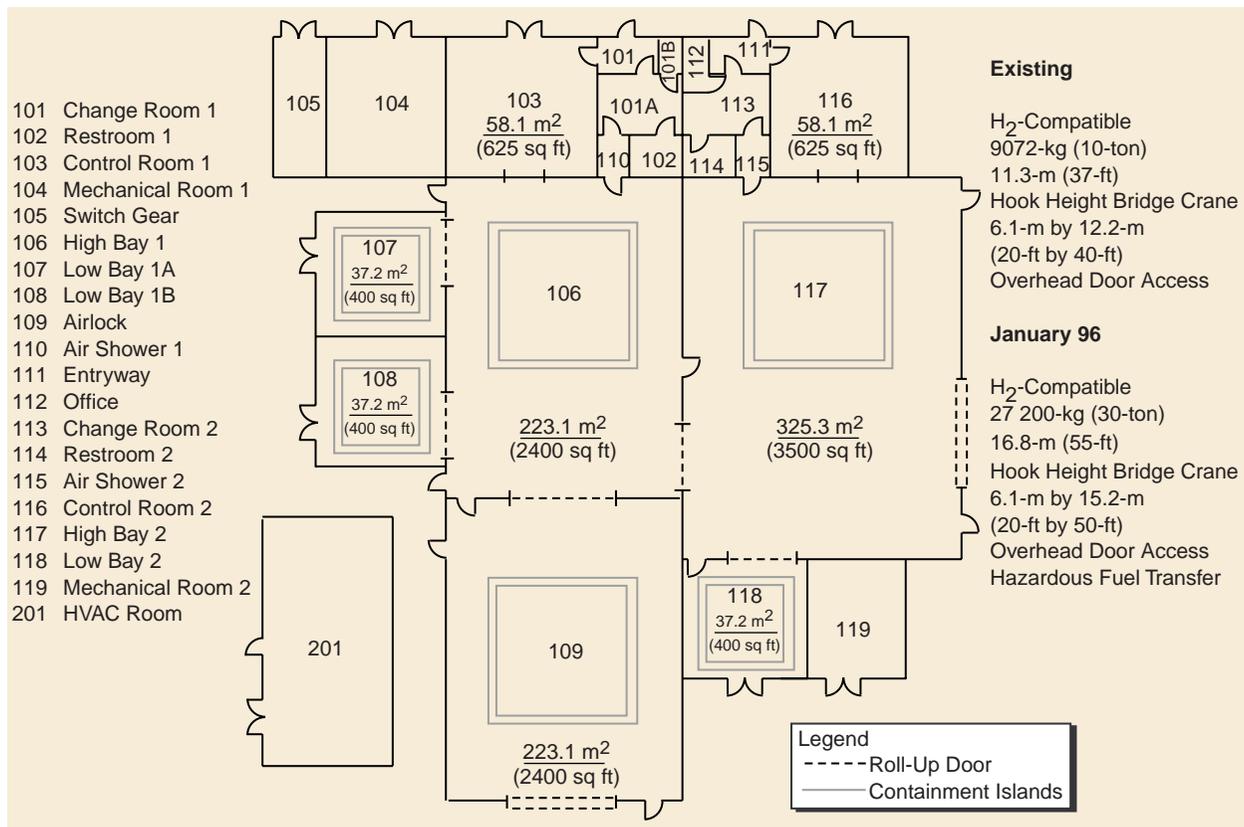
Astrotech Payload Processing Facility (Building 1032)
